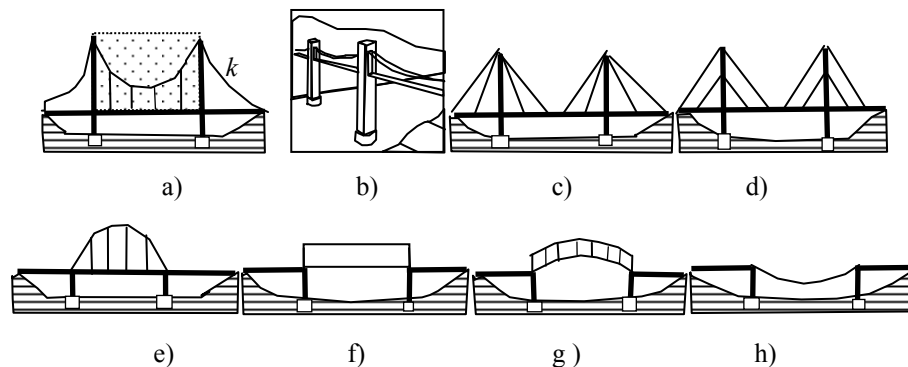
Bridge types. a) Suspension bridge; b) Schematic reconstruction picture; c) Cable stayed bridge of fan type; d) Cable stayed bridge of harp type; e) Parabolic form analogous to constant edge stress beam; f) Straight stiff beam bridge; g) Arch form; h) Only cable with small bending resistance
